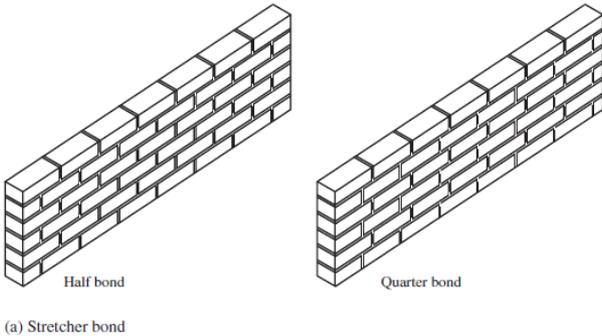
Single leaf walls [Hendry & Khalaf, 2001, page 68]
